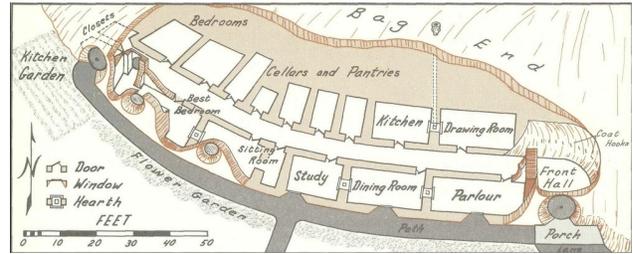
Fonstad’s Bag End floor plan with scale [3].
